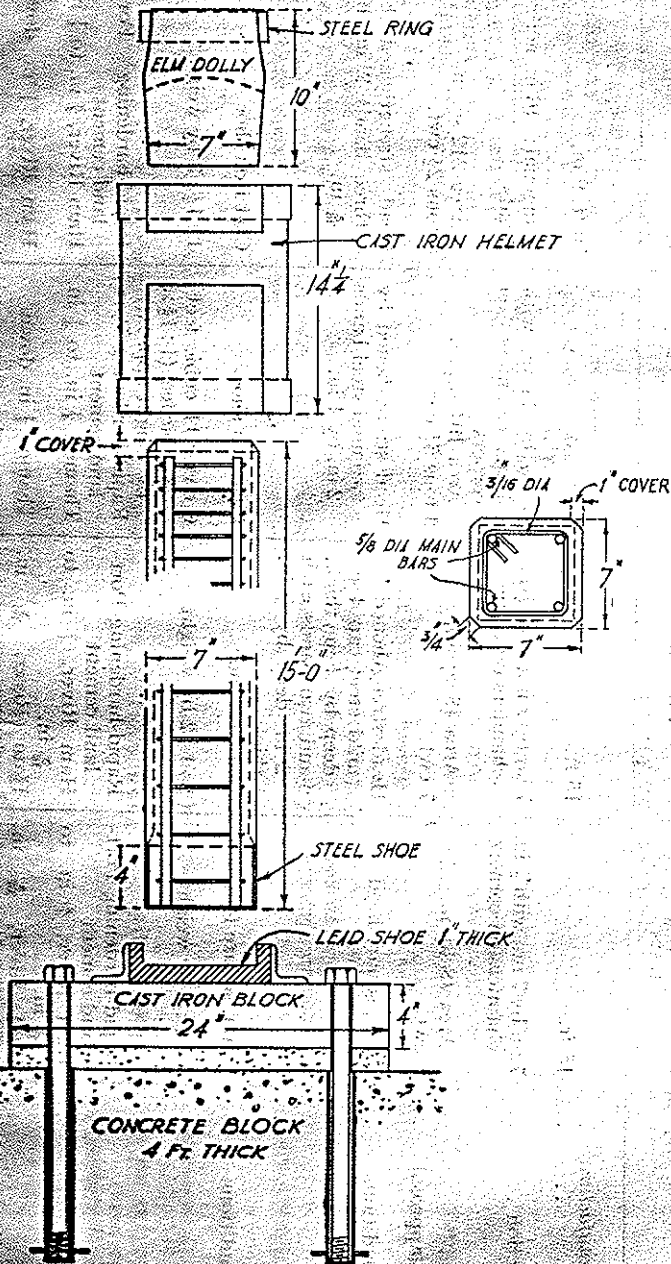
Driving Conditions for Piles tested in the Concrete Pit.
